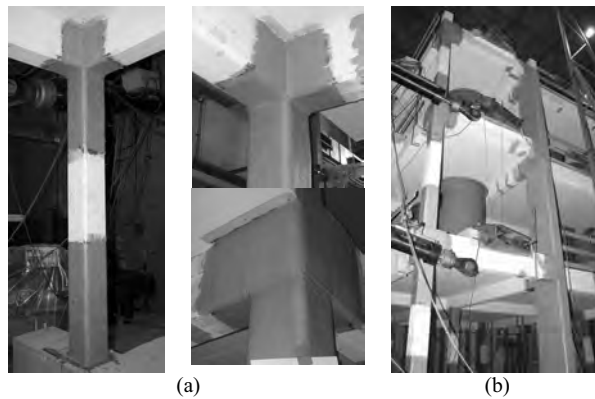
Column confinement and shear strength of corner joints (a); shear strength of wall-type column and retrofitted structure overview (b) (Di Ludovico et al. 2008a).
